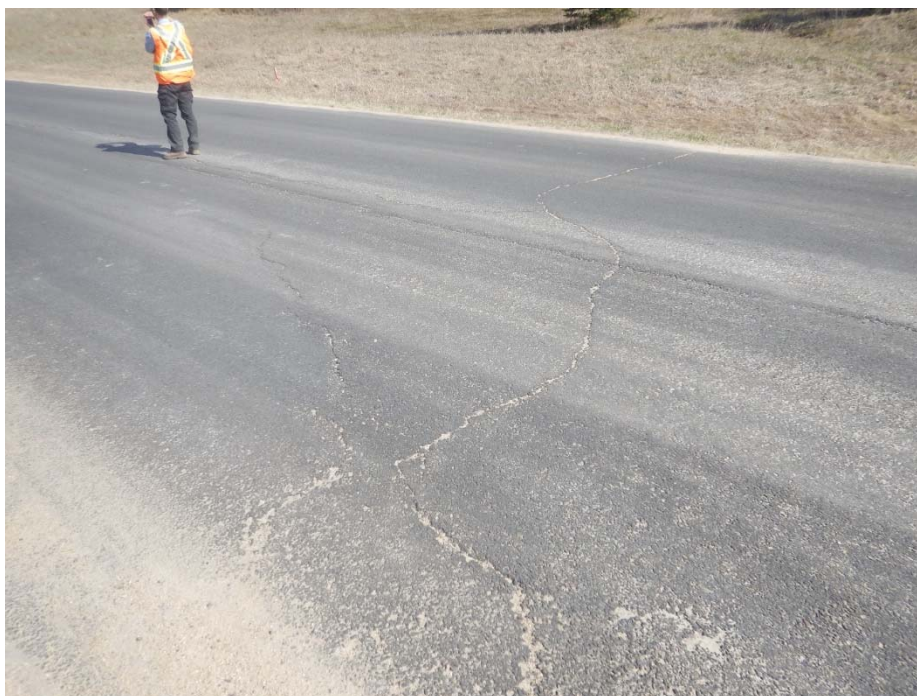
Reflective diagonal crack after 2017 ACP patch at the southern limit of Mid-Hill Slope Section (looking northeast)
